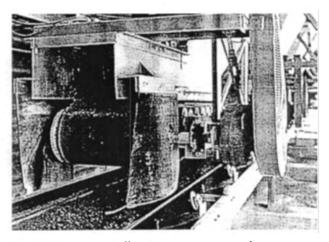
Collecting conveyor under cold-feed bins.
